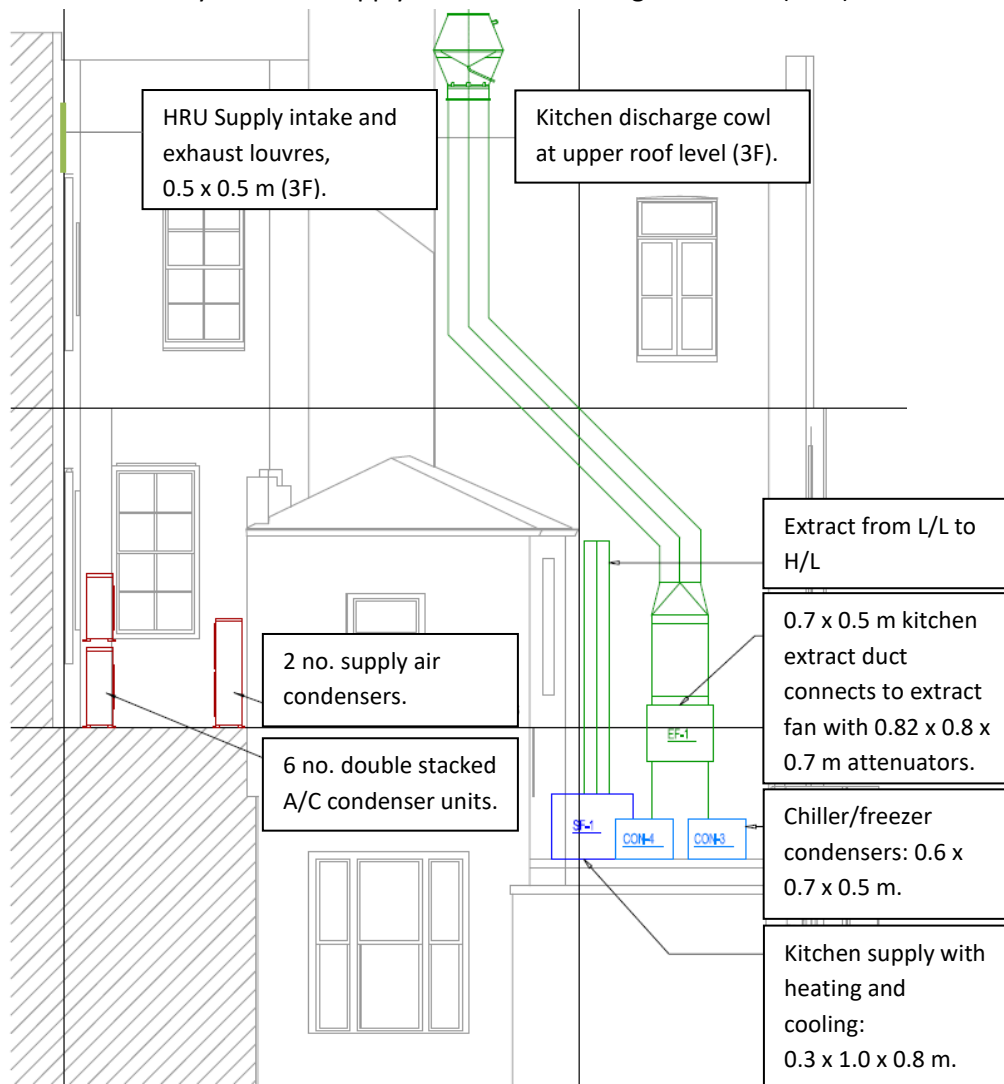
Proposed North Rear elevation illustrating proposed locations of external plant.
